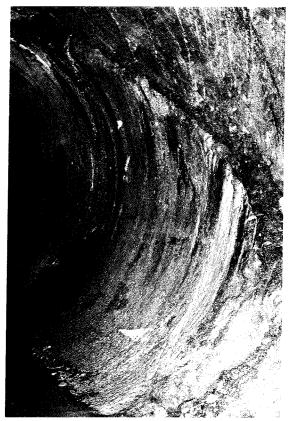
m long drapery leakage (v-∛) from steep fissure parallell to the tunnel, and in the contact to a crush zone. 4/260
